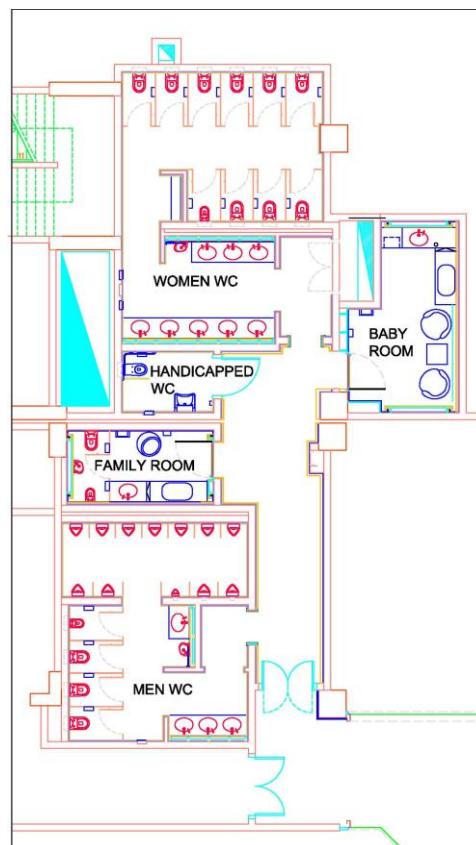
Plan view of a typical rest room at ground floor in Forum Istanbul.
